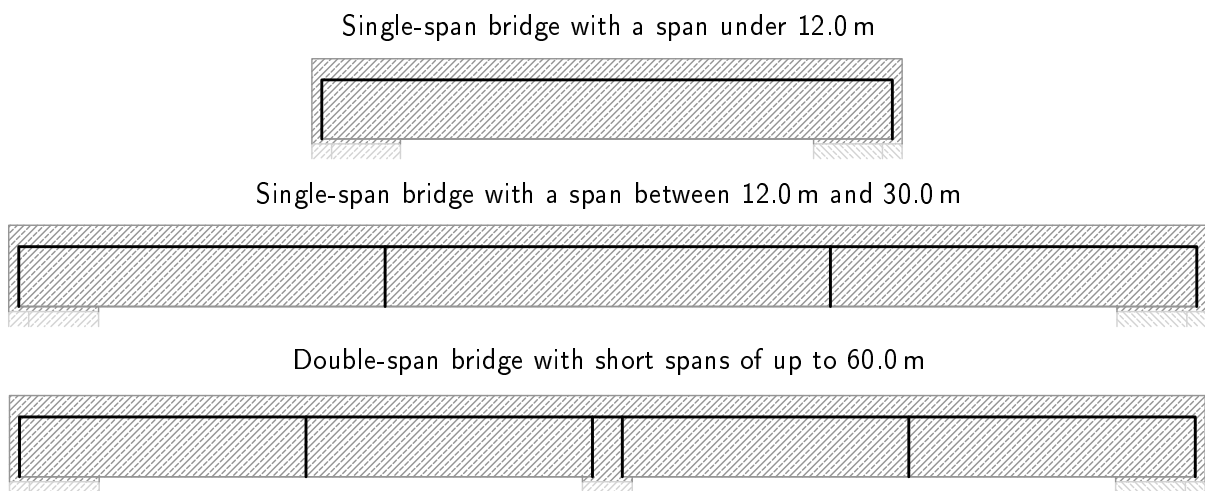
Single-span and double-span bridges using lightweight thin-walled girders with a illustration of the vertical and horizontal joints
